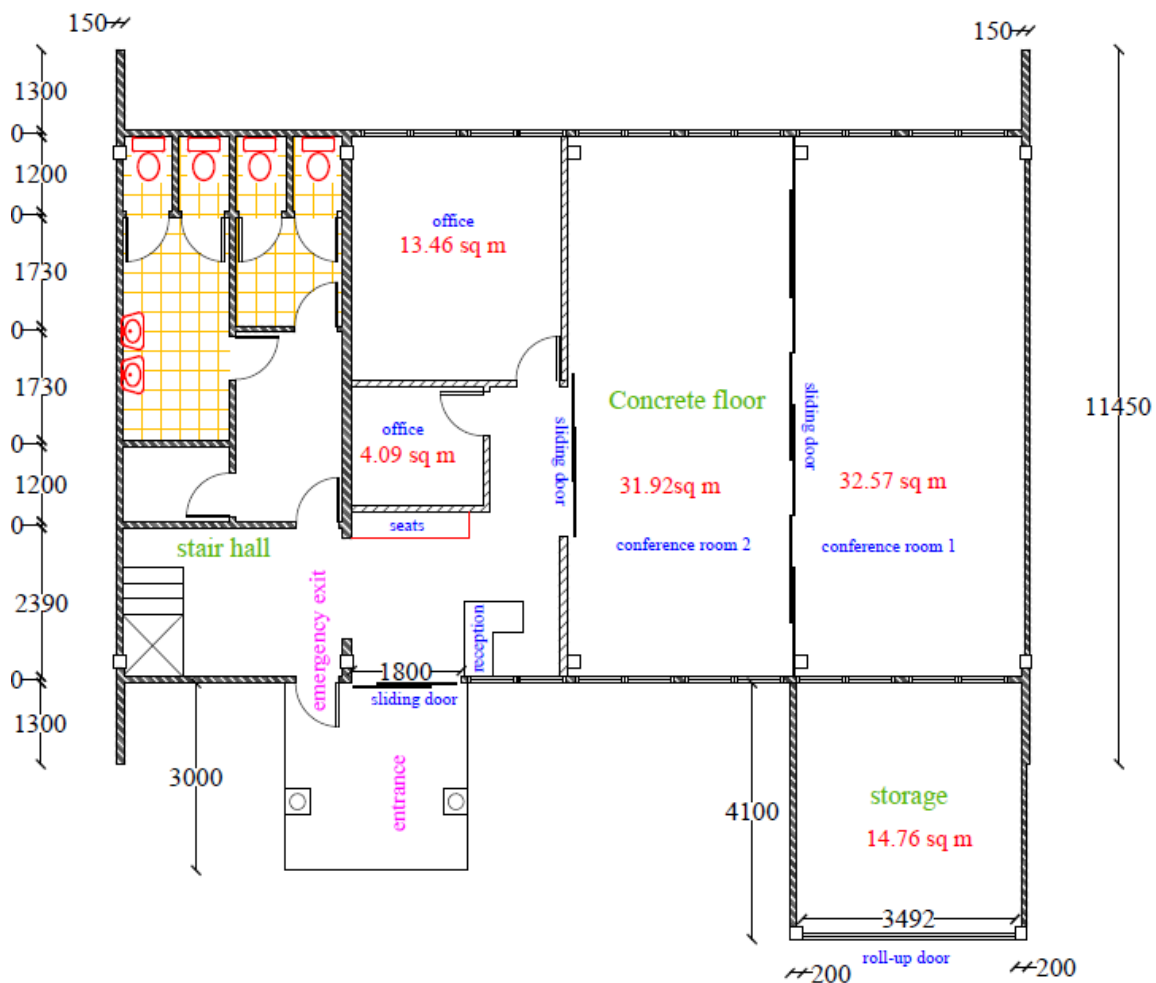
Floorplan SCU building: groundfloor (Source Mohangoo, 2020. Project documents SCSRP)
